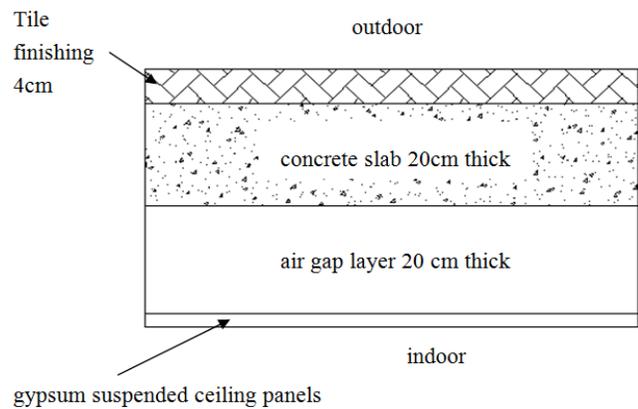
Section of the commonly used roof of the buildings in Duhok City
